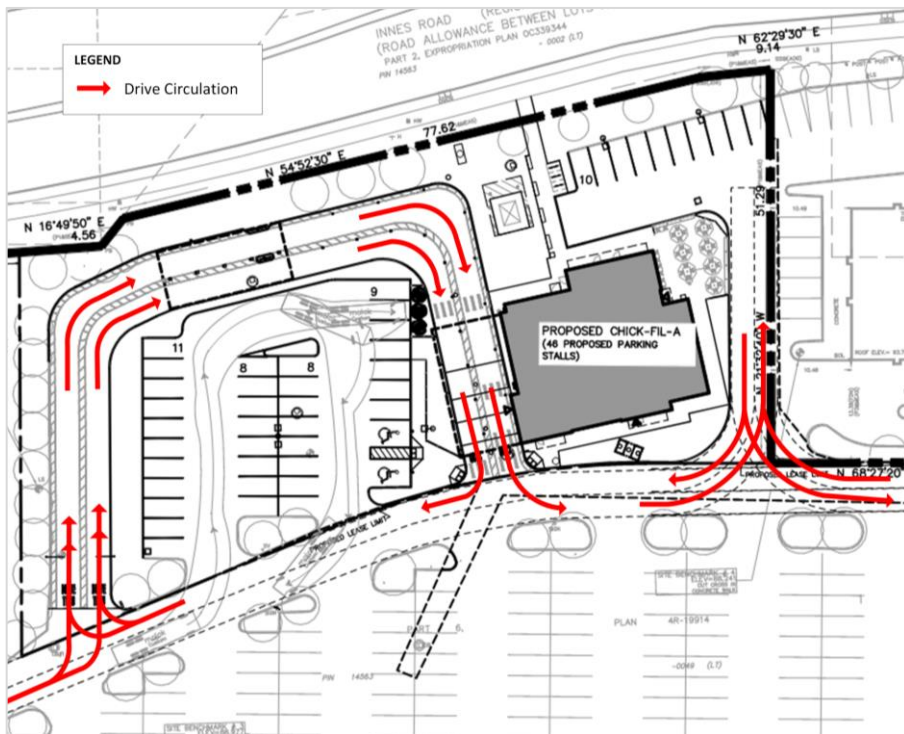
Internal Driveway Circulation and Drive-Thru Access Locations
